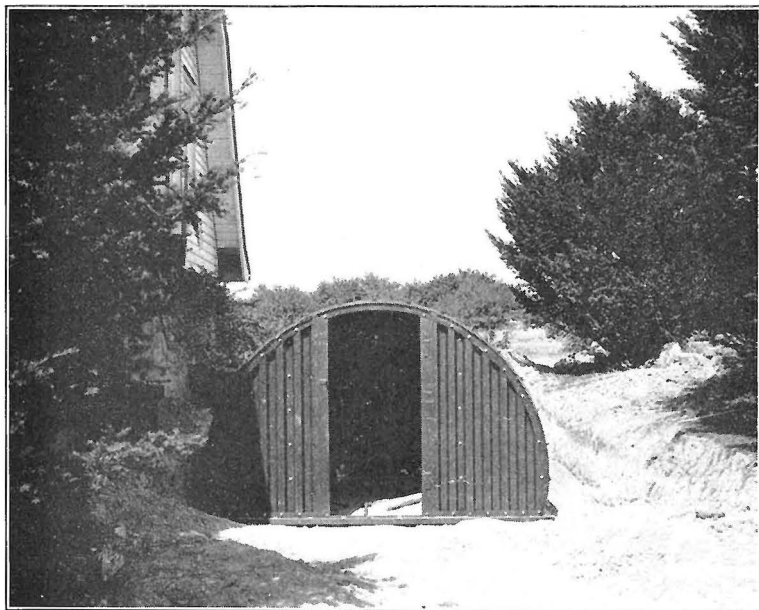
Storage ready for door, parapet, and retaining walls.
